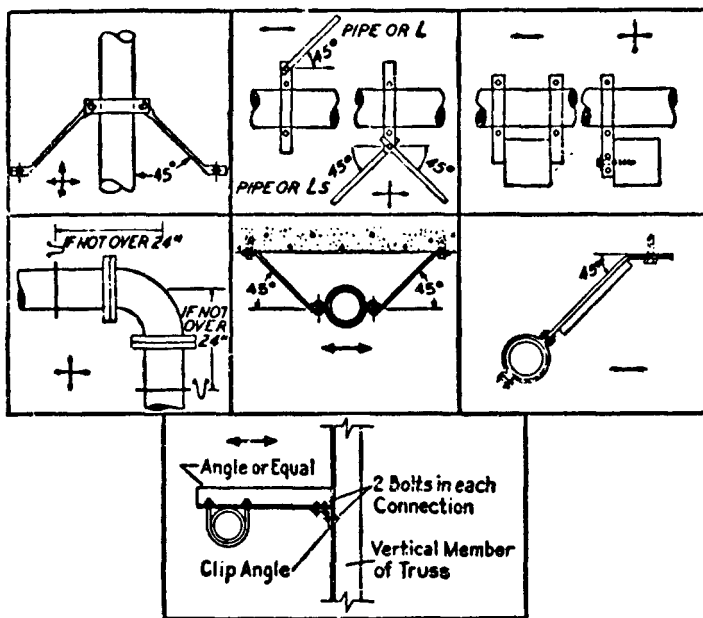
(e) Acceptable Types of Sway Bracing.
